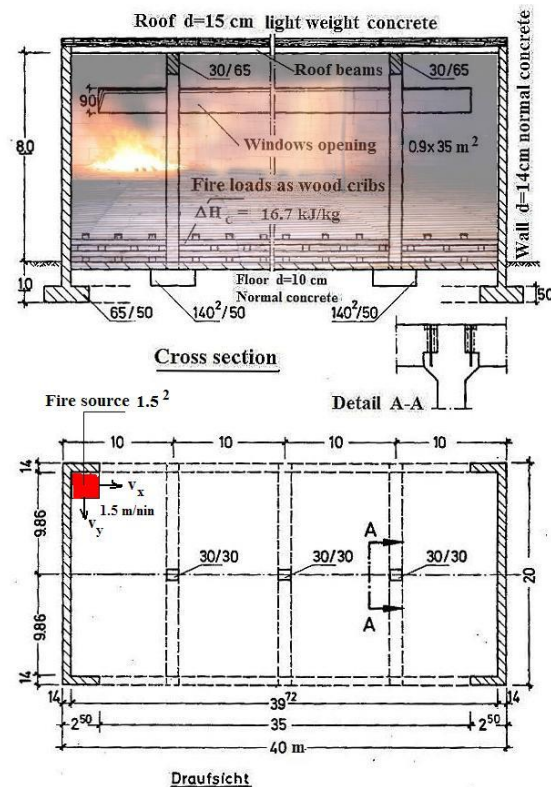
Geometry of the investigated reinforced concrete hall building
